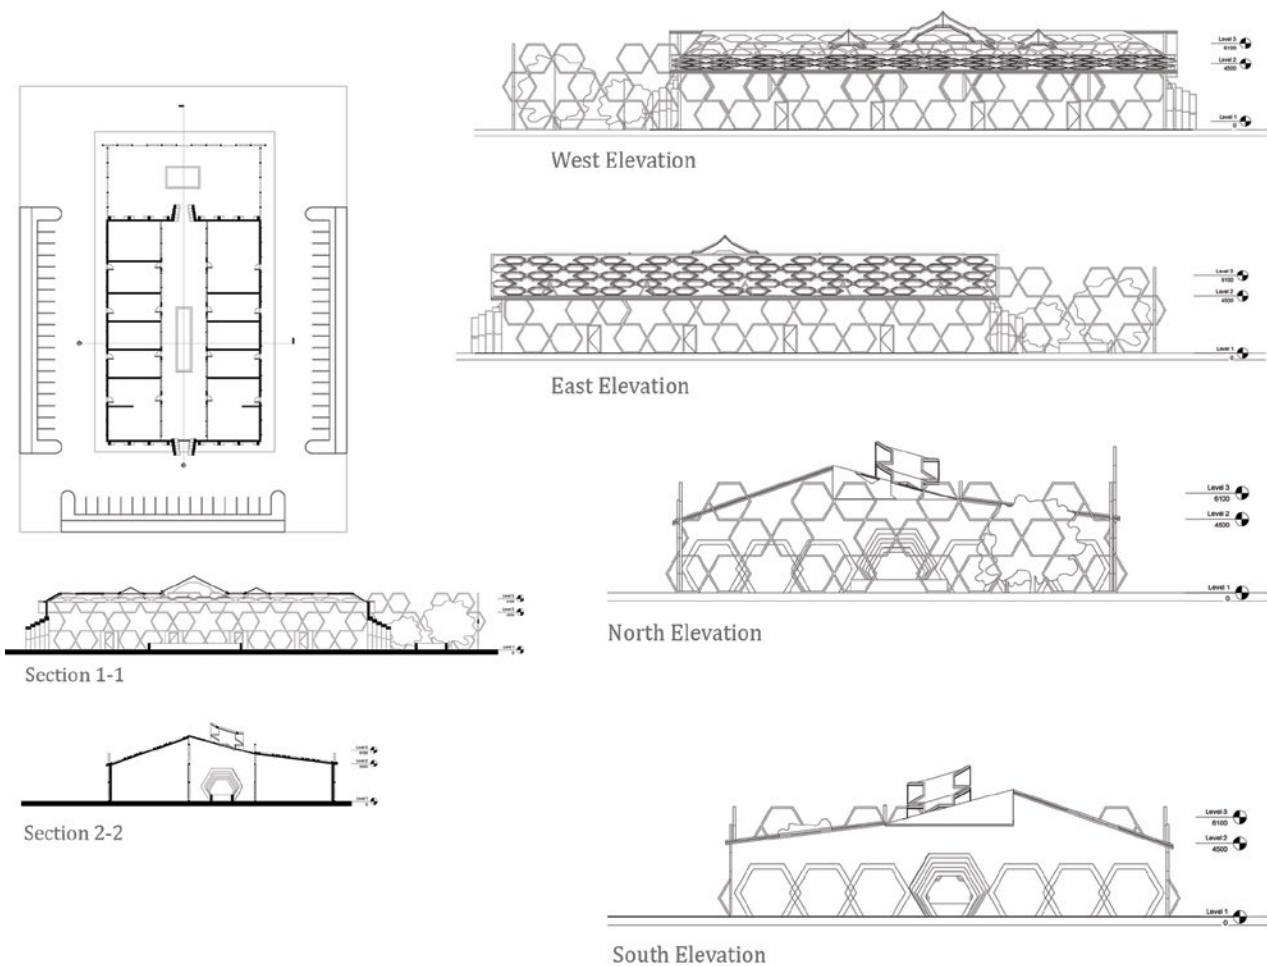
The typological plan, elevations and sections, which are going to be adapted to two sites
